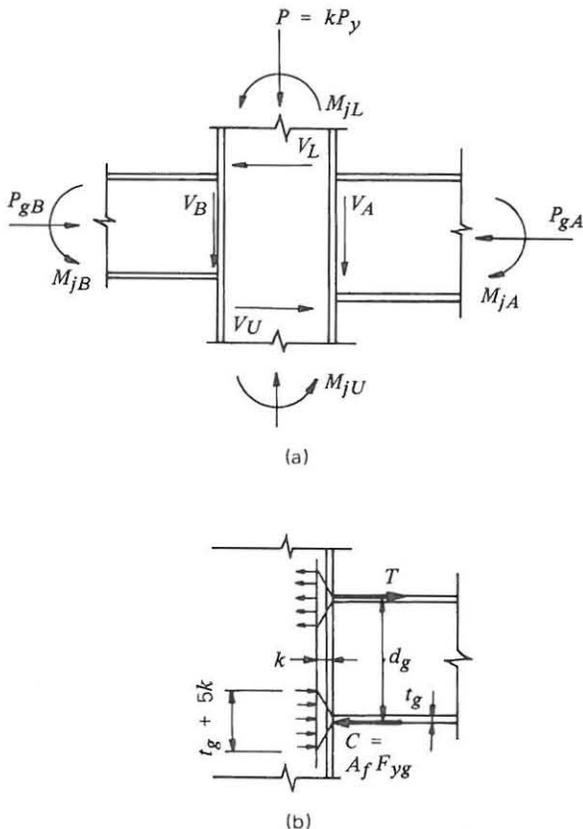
FORCES ON INTERIOR GIRDER TO COLUMN CONNECTION
